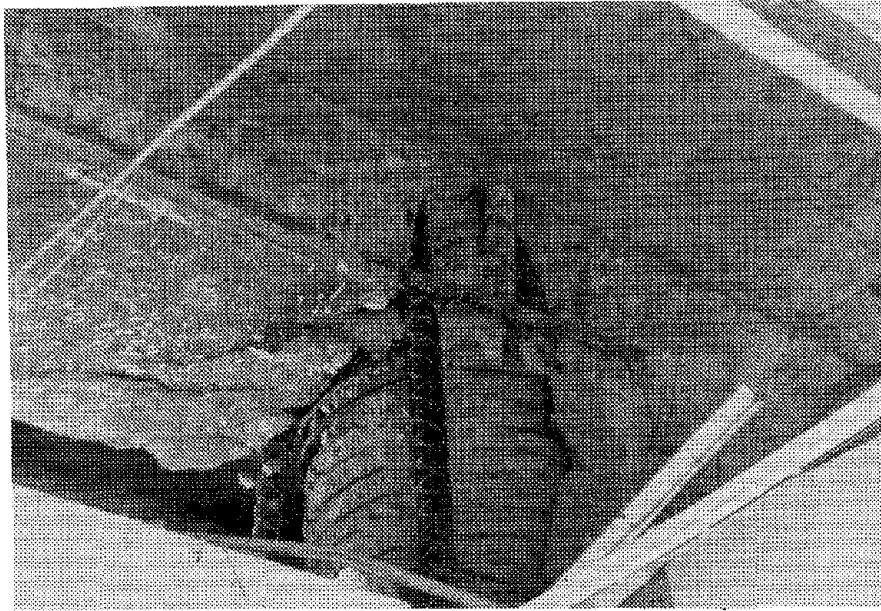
SHEAR FAILURE OF JOINT AT TOP OF FIRST STORY SPIRAL COLUMN L-17. SPIRALS TERMINATE AT BOTTOM OF BEAM FRAMING INTO COLUMN FROM ONLY ONE SIDE
